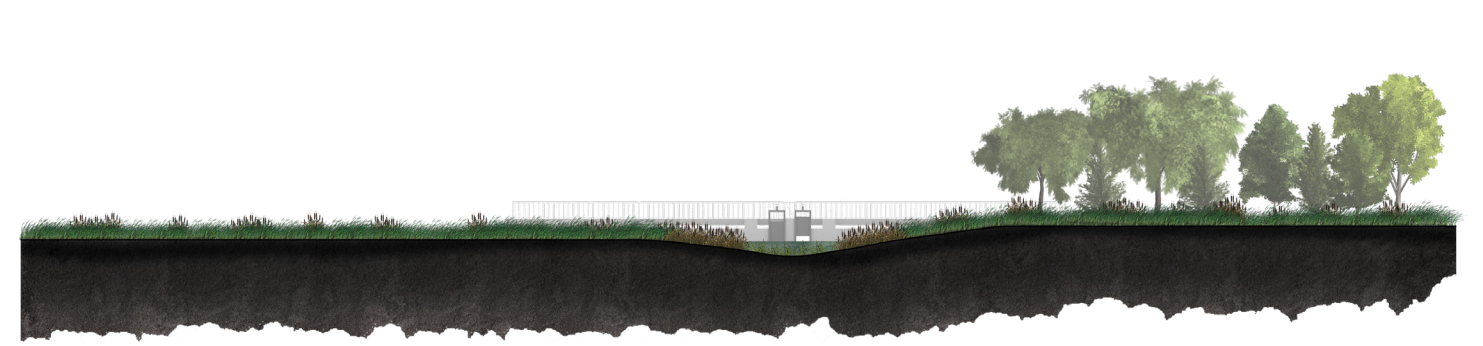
Section EE - Section cut facing the water control structure on the north side of the channel
